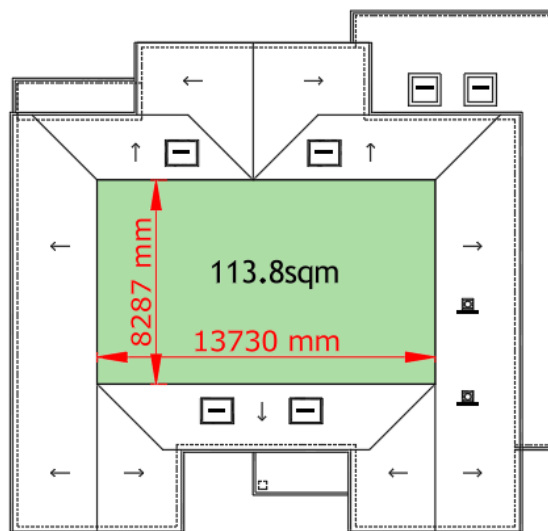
Proposed crown roof at no.119 Ducks Hill Road
